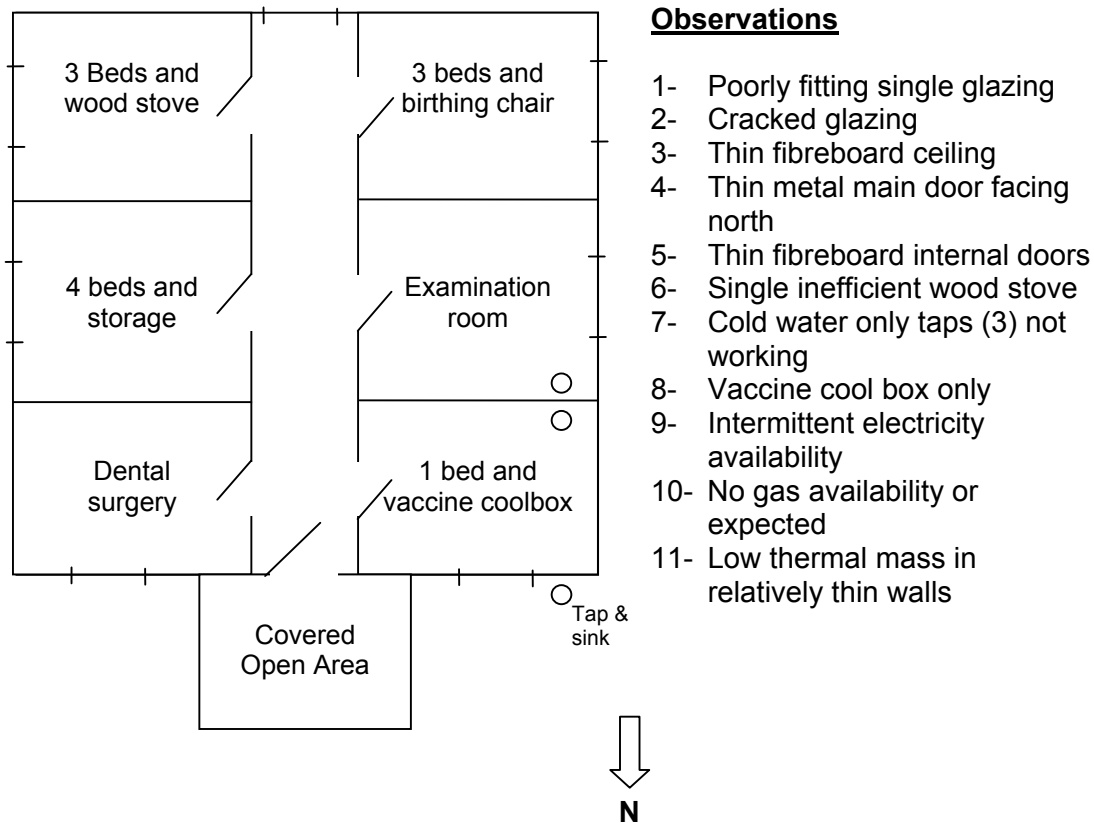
Qara Jali Medical Centre Building Layout and Observations
